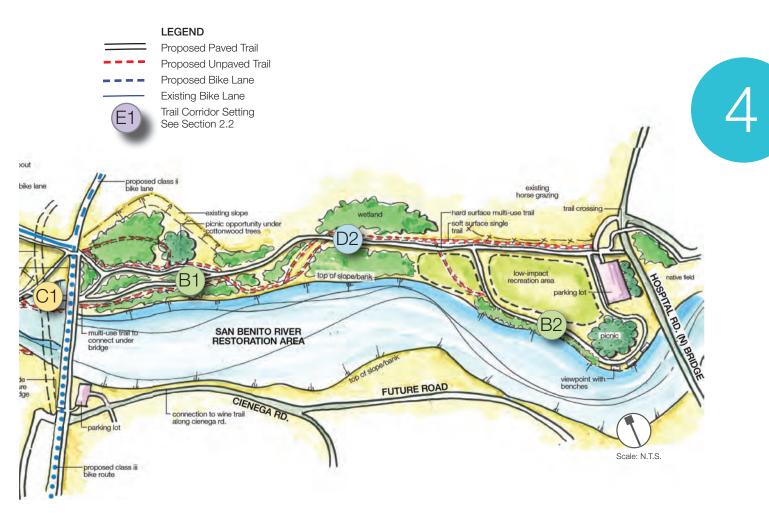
FOCUS AREA ENLARGEMENT PLAN-SECTION 4
